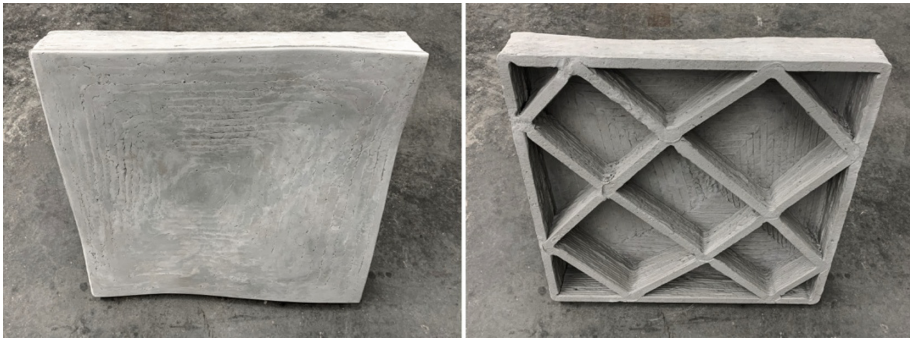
(left) Double curved face printed on finished mold. (right) Stiffening Ribs and flanges printed with variable layer thickness.
